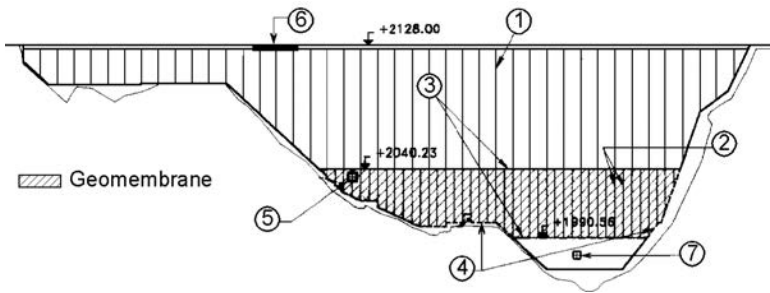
Upstream side of the Alpe Gera Dam with the renovated section (Fanelli et al., 1995). (1) Vertical constructional joints; (2) vertical profiles (sections); (3) perimeter sealing of the existing steel; (4) perimeter sealing of the existing concrete foundation; (5) supply tunnel; (6) overflow; (7) outlet.
